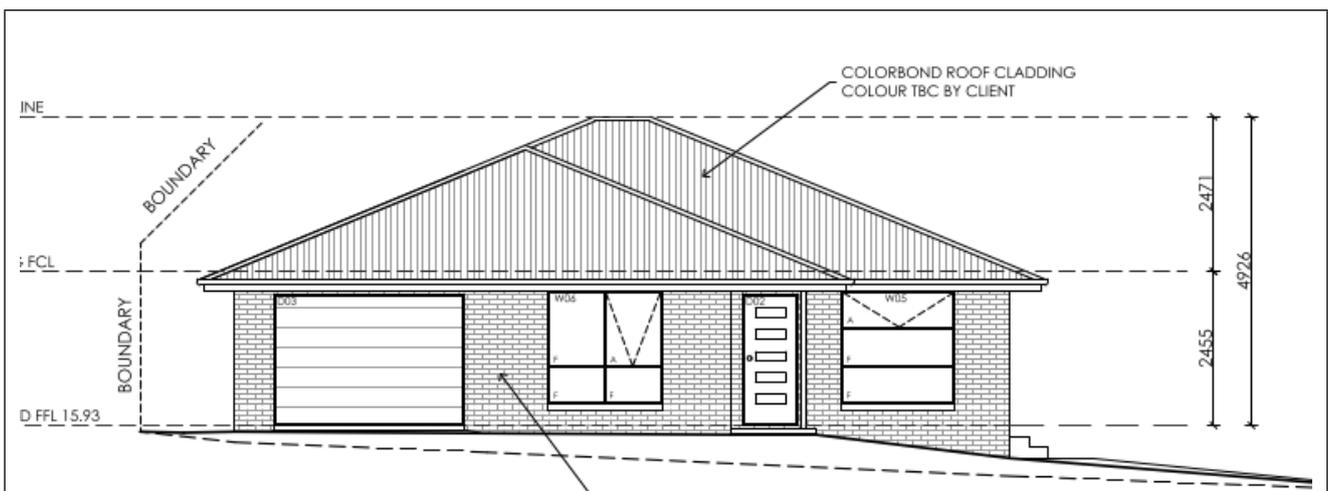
Northern elevation (Source: RFS Projects Pty Ltd)
